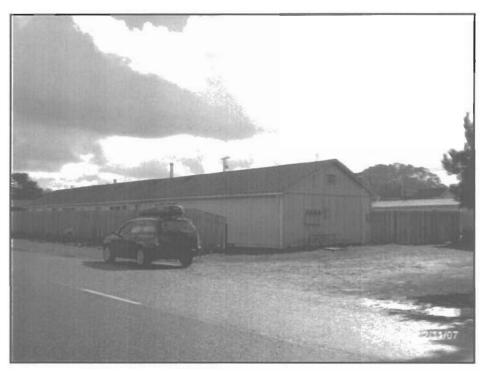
Multi-family residential unit on the corner of Murray Road and Daffodil Avenue, across the street from the subject parcel (view from the future Hammond Bypass Trail extension along Murray Rd).
